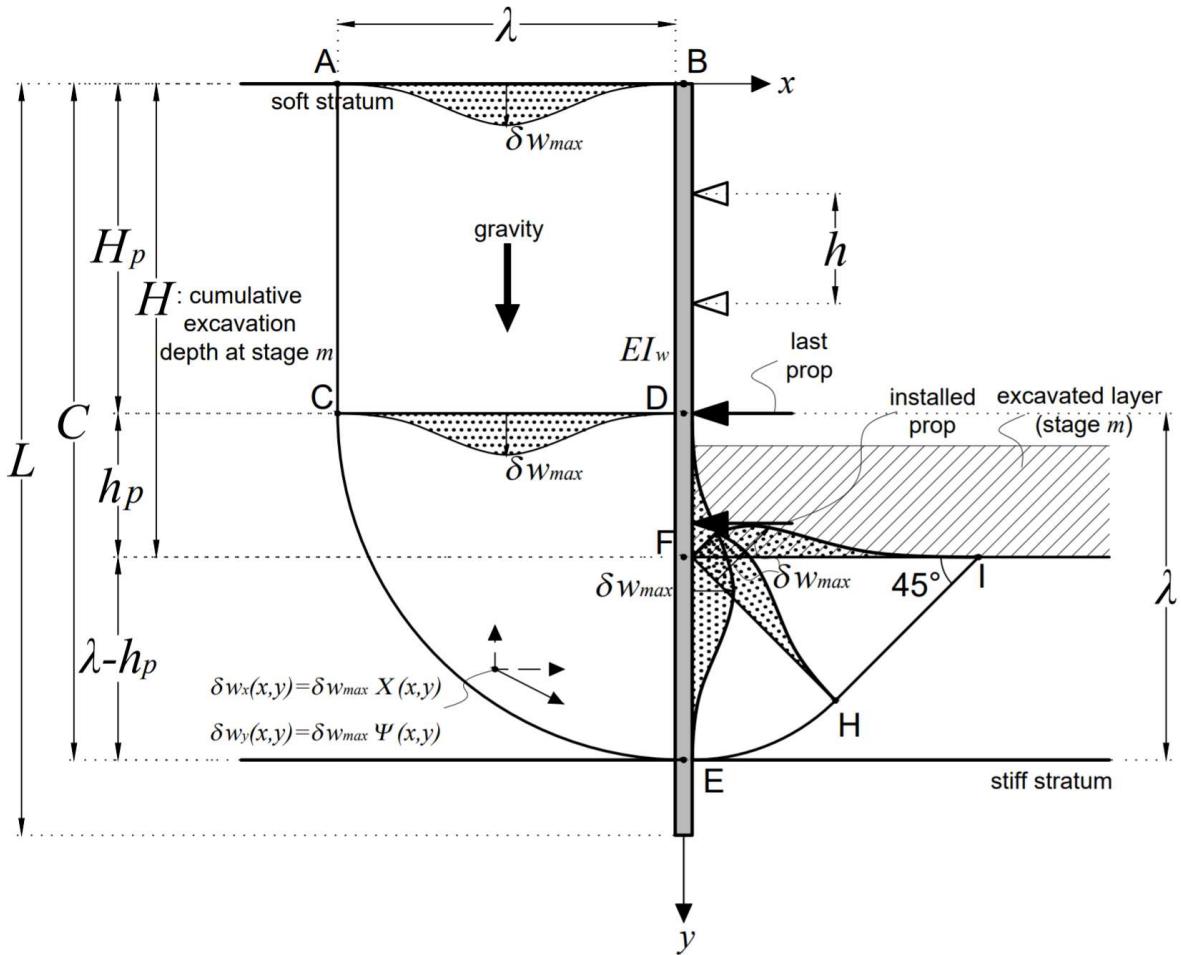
Incremental wall bulging at excavation stage m , plus plastic deformation mechanism considered for propped wall.
